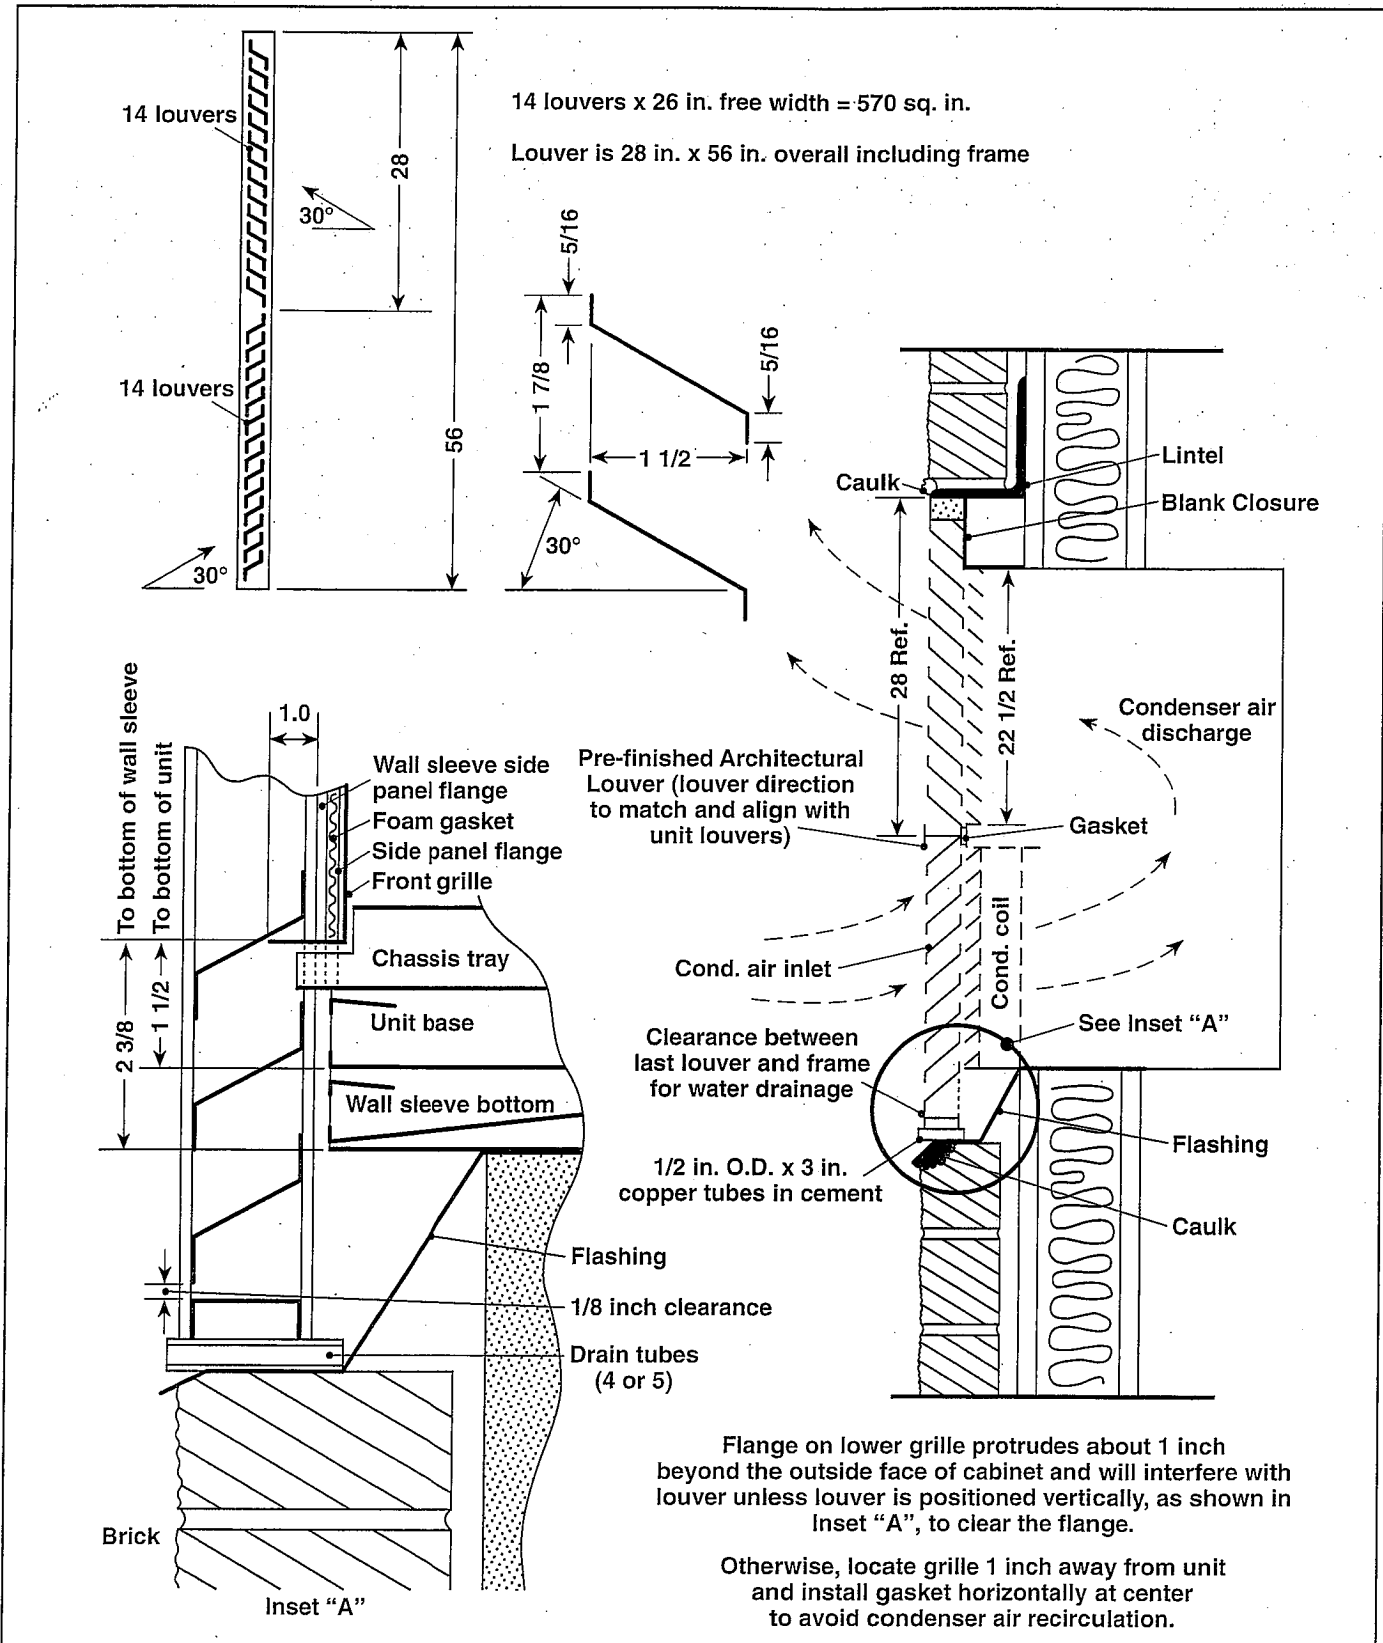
Louvered facade shown in cross section and enlarged section with dimensions.
